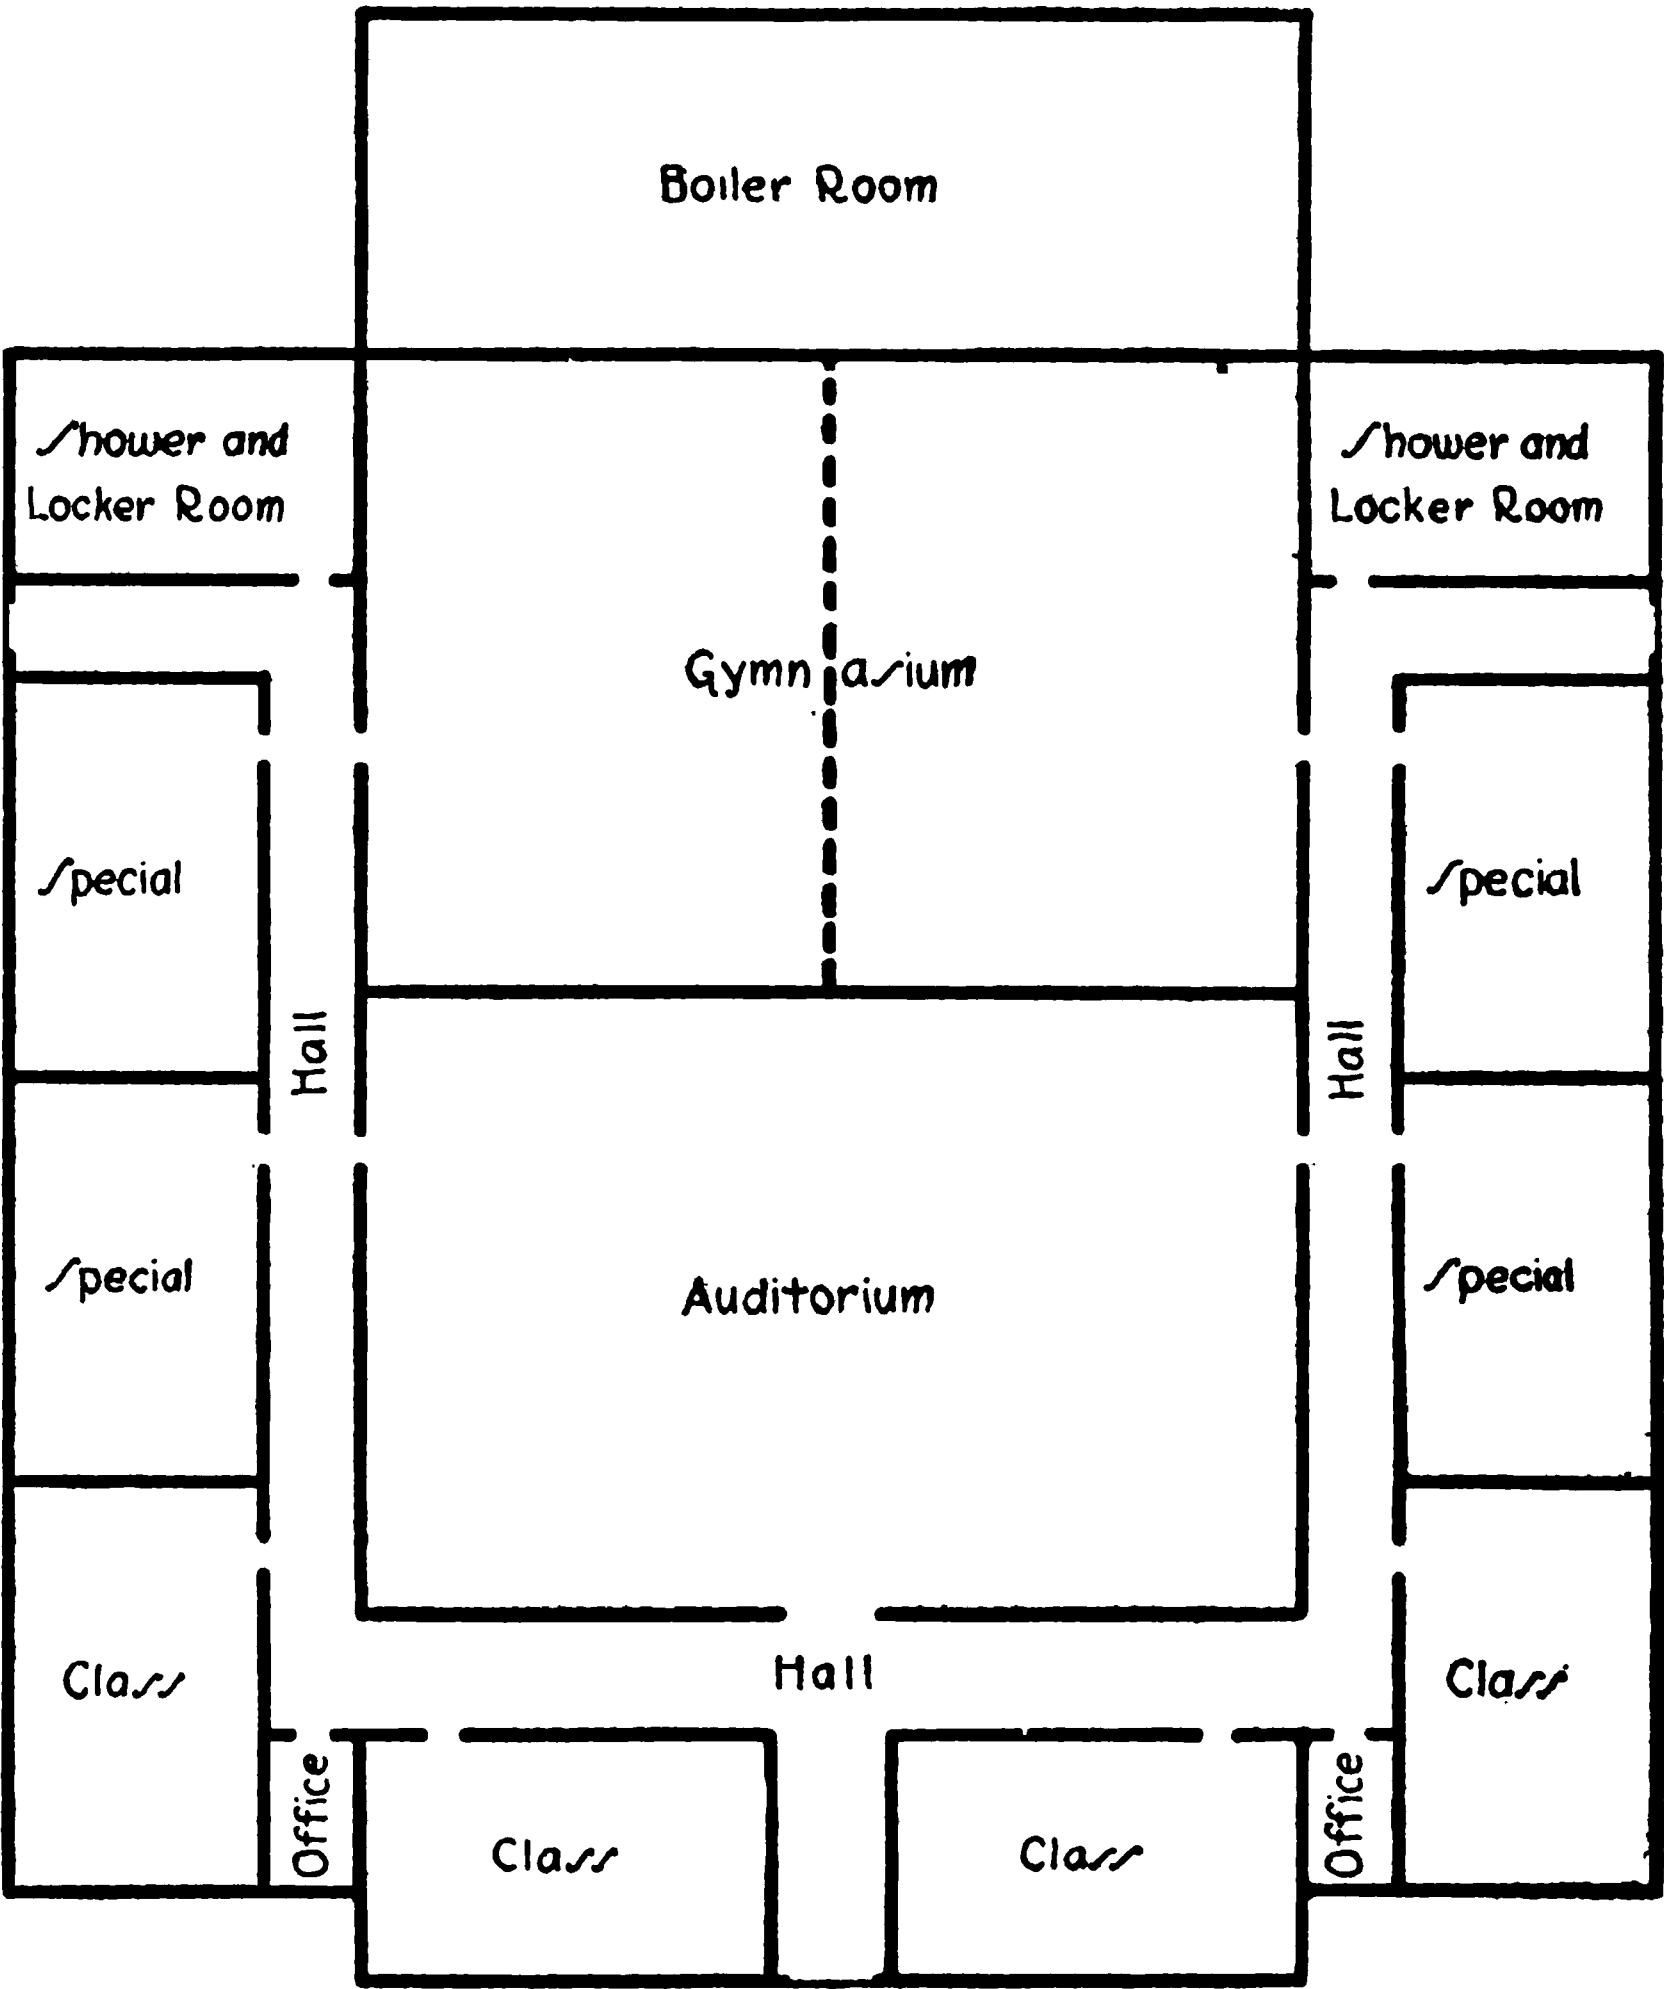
EXHIBIT C.—Suggested addition for Oconee School This plan, with the addition of two rooms, is also applicable for Baxter School.
